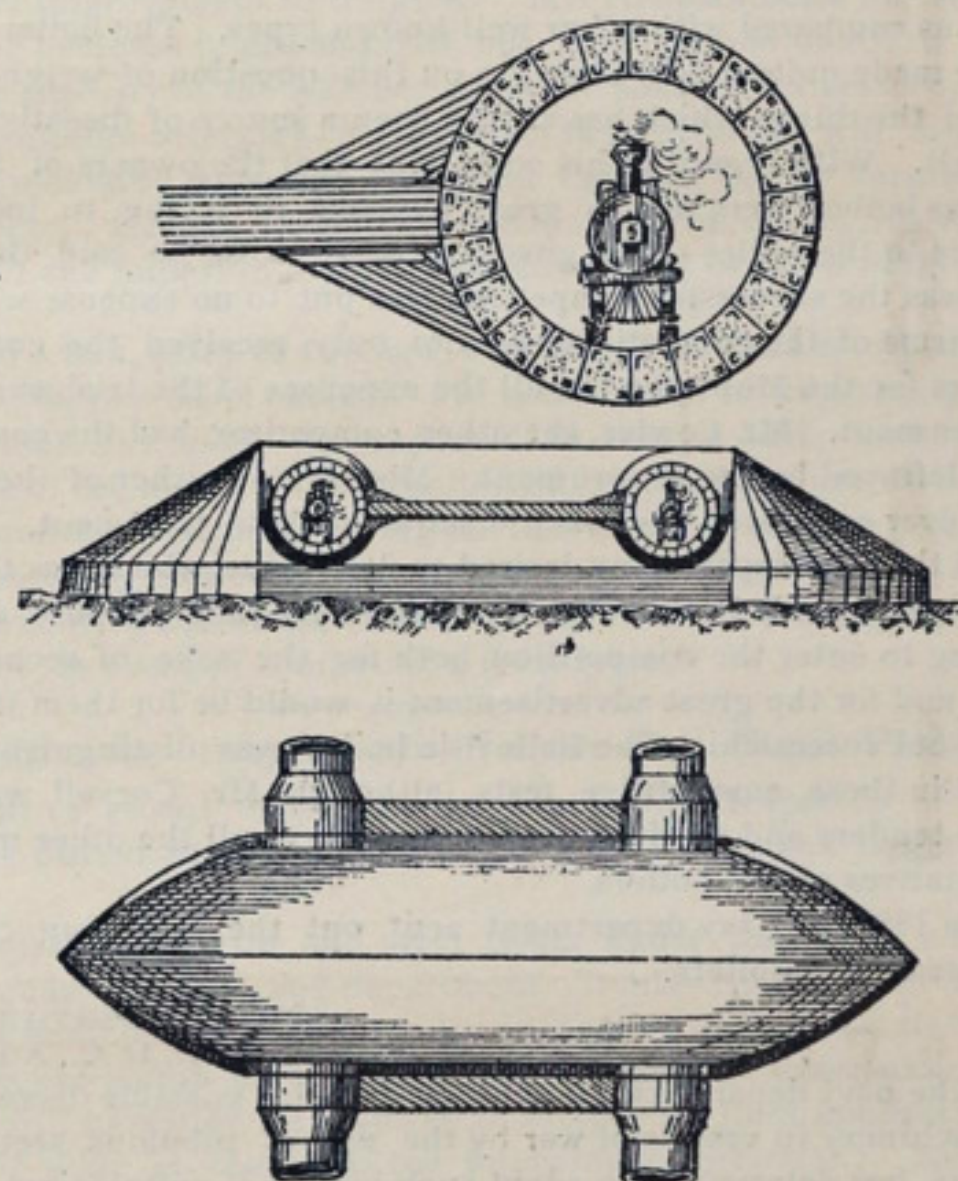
TRANSVERSE SECTION AND PLAN OF THE TUBES AND OF A PIER.
